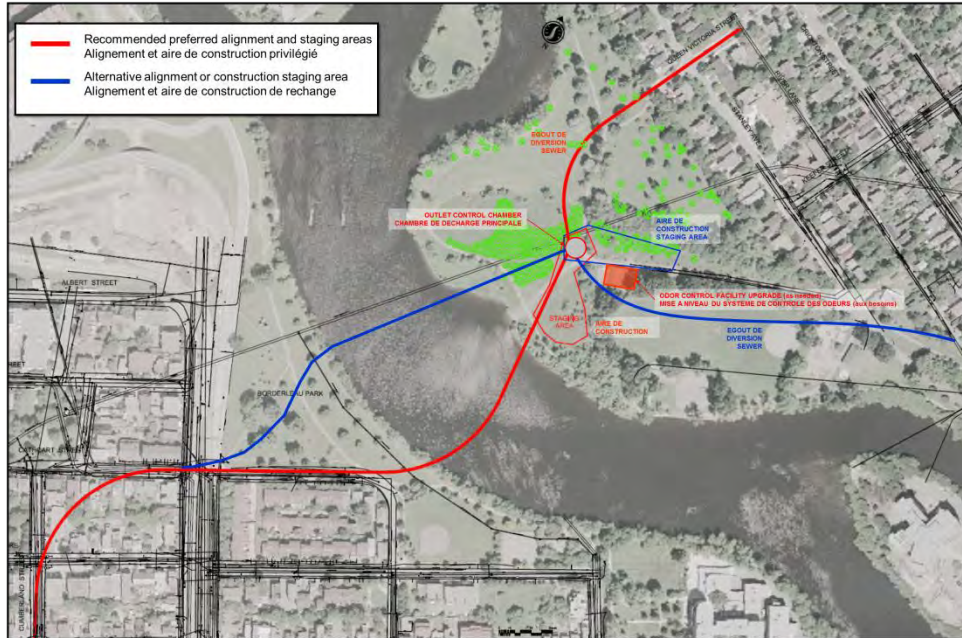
Site 6 River Lane at Keefer; site plan of the Project Area showing the preferred alignment, proposed staging areas and odor control facilities.
